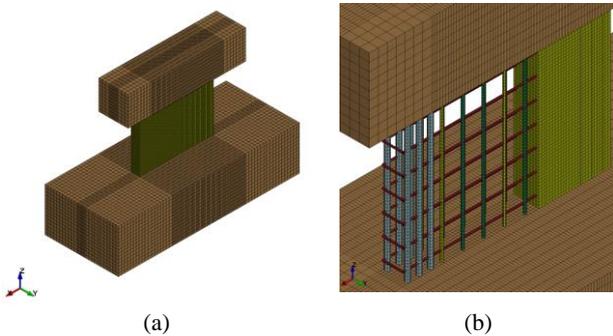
Numerical models of (a) shear wall and (b) rebar in concrete wall
